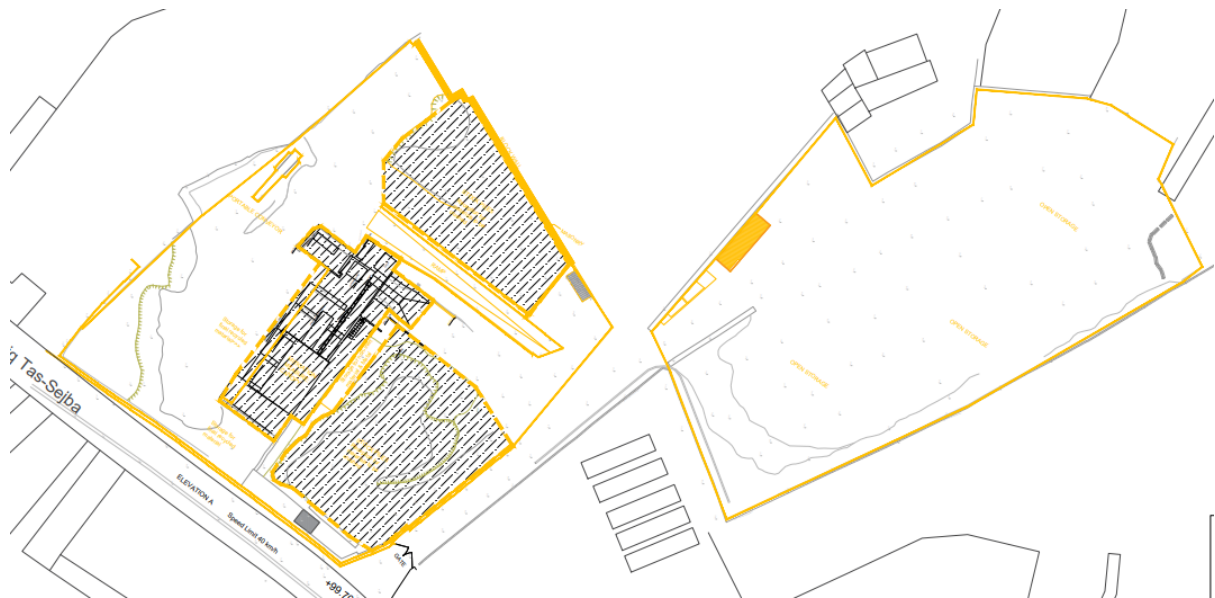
Existing plan, with rock crushing and recycling facility in western part and open storage area in the eastern part (*Source: EApps doc PA/08500/21 – 52g*)
